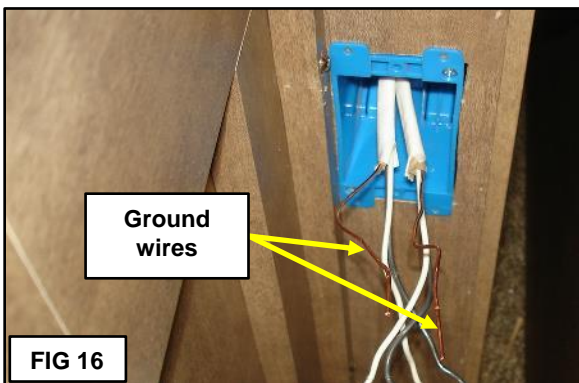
Cut one of the bare copper ground wires about an inch shorter than the other. It does not matter which copper wire you shorten.
